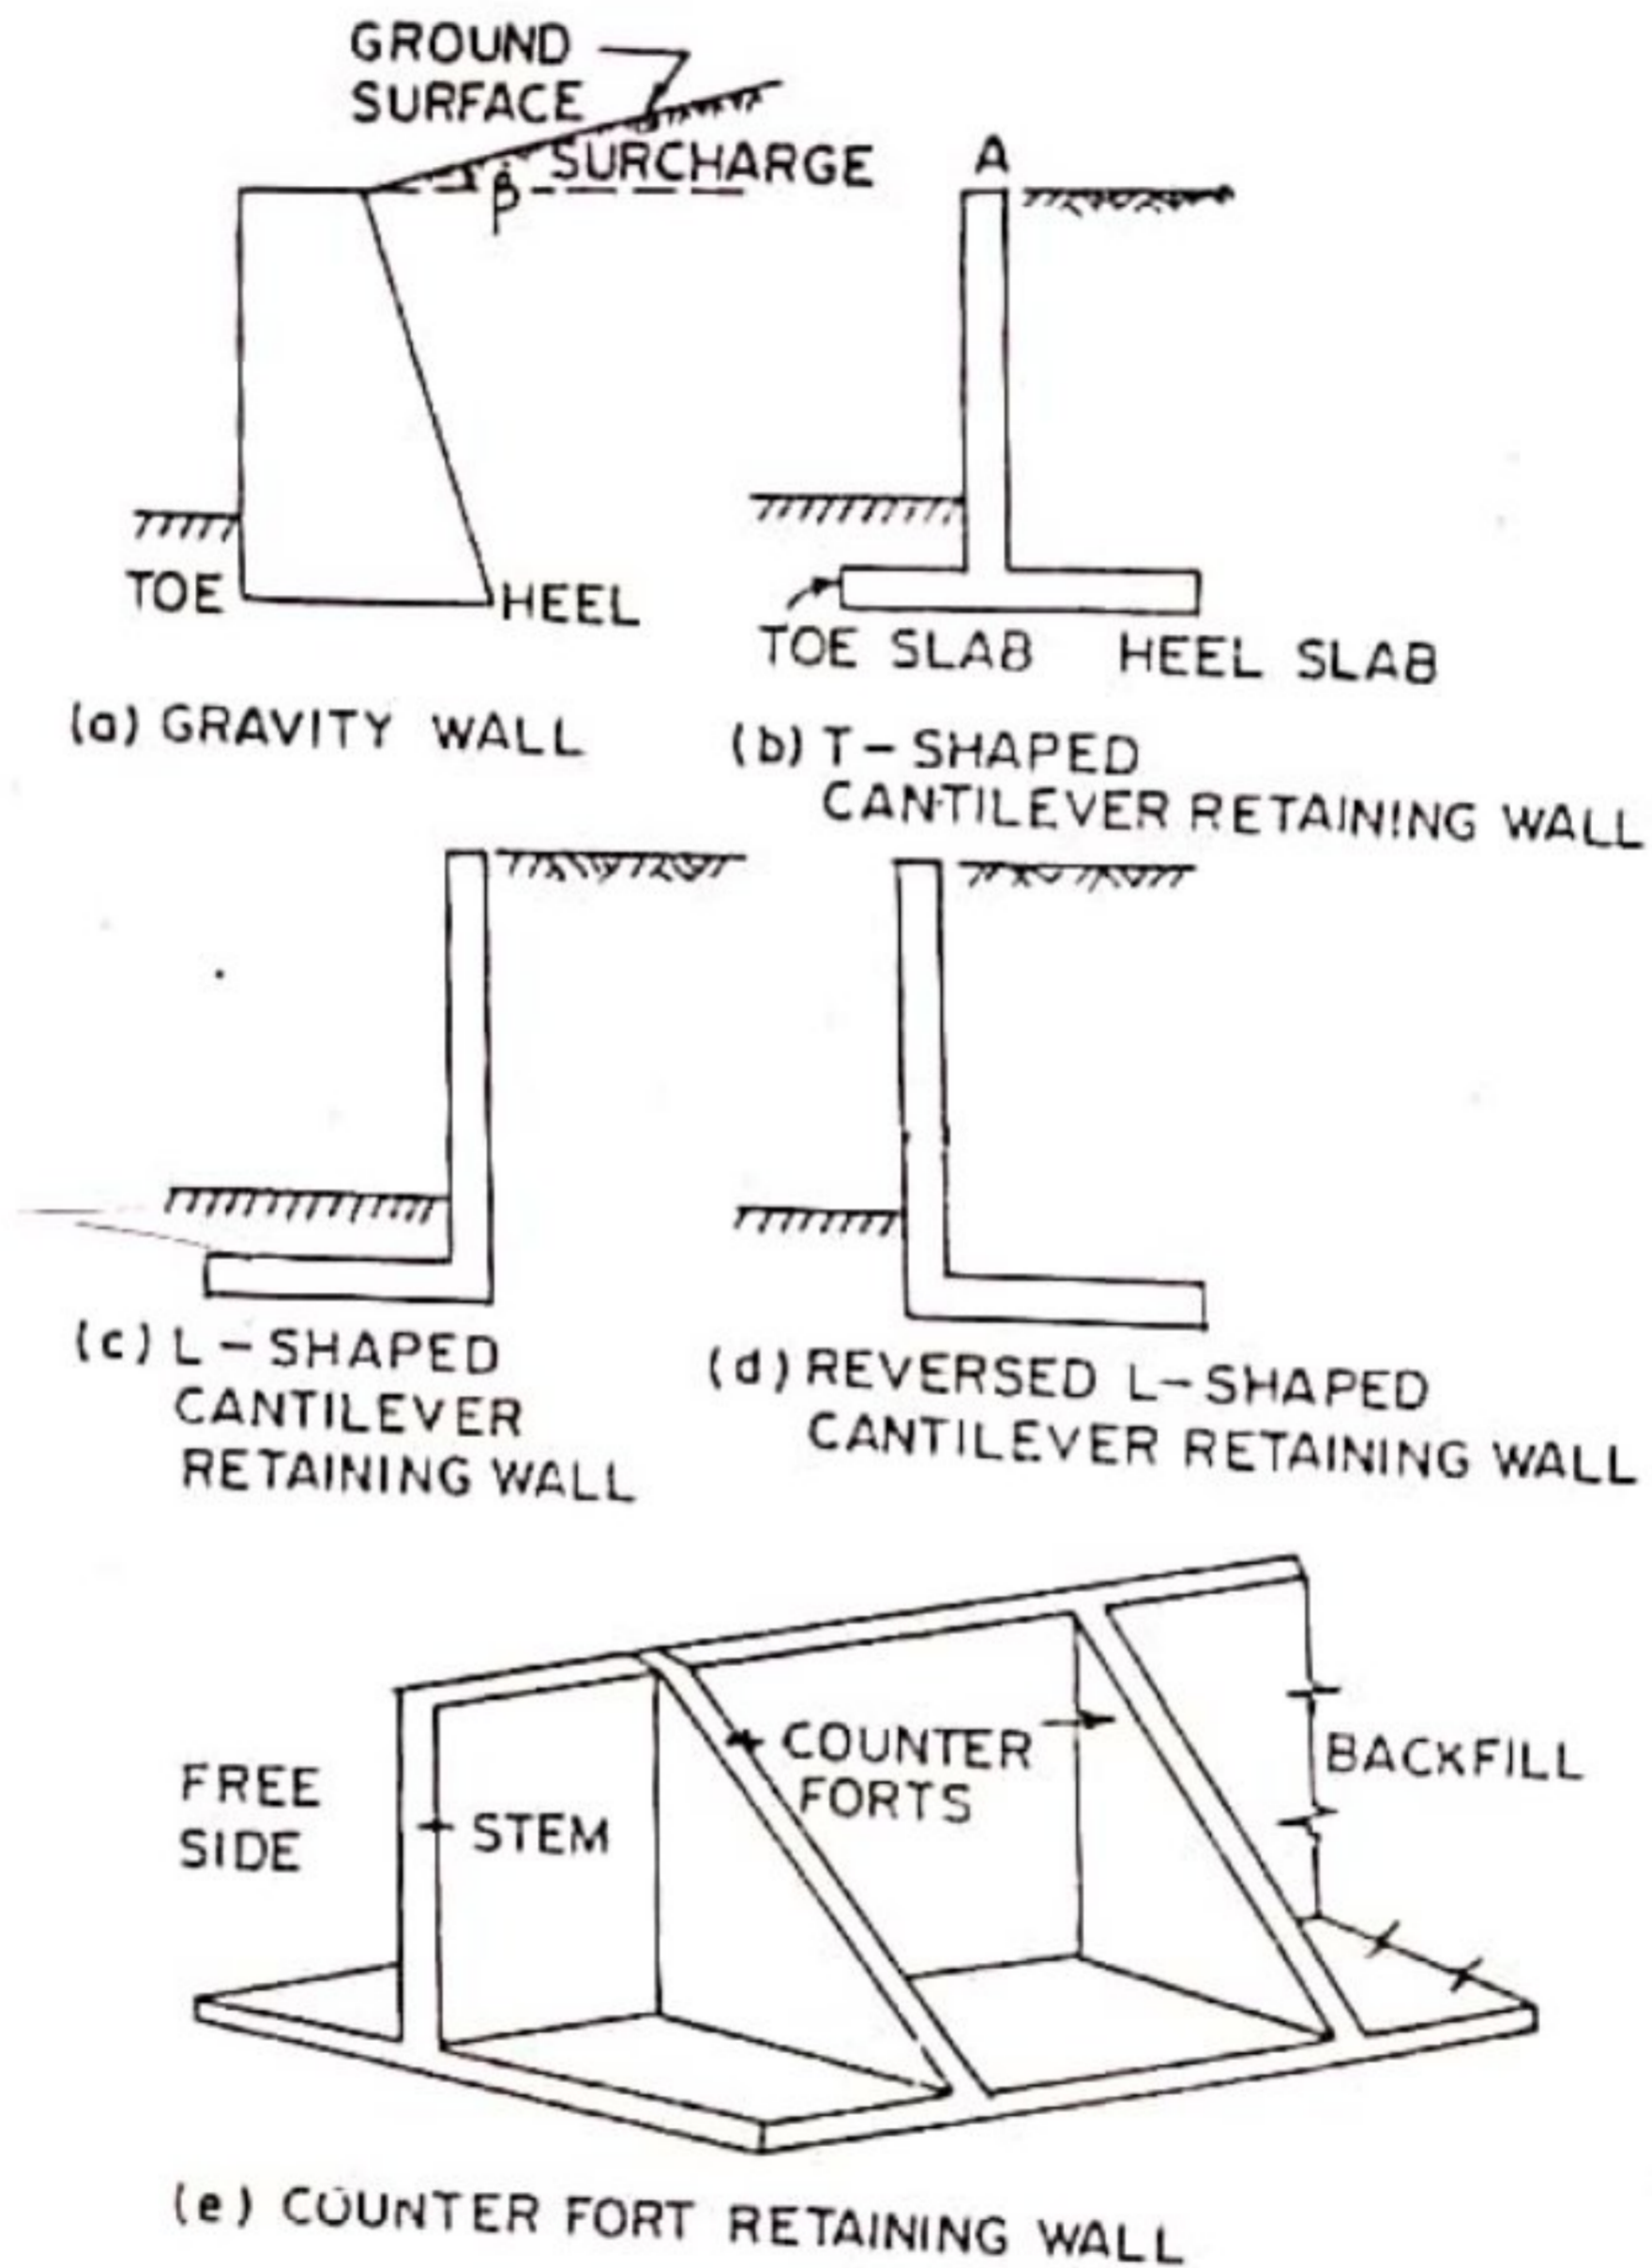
VARIOUS TYPES OF RETAINING WALLS.
